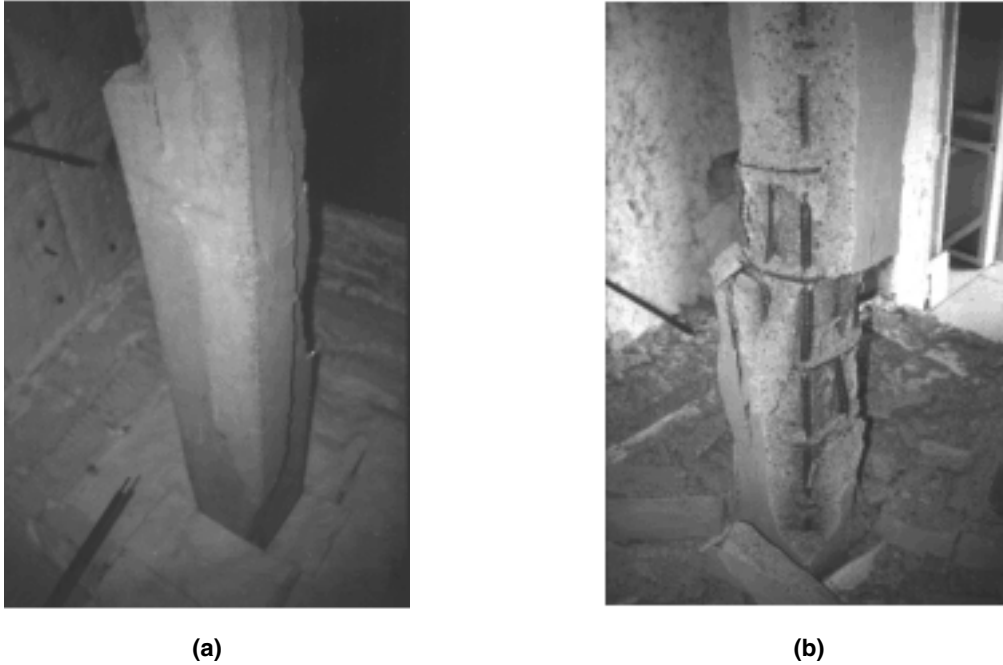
Spalling in NSC and HSC columns after exposure to fire:³¹ (a) normal-strength concrete column, and (b) high-strength concrete column.
